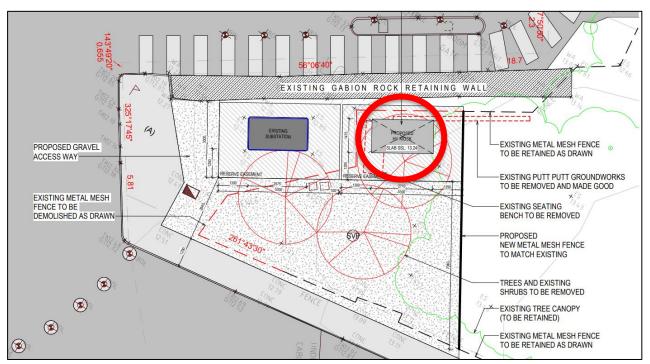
Proposed kiosk substation drawing, with proposed kiosk shown in red (*Source: Proposed HV Kiosk Plan, prepared by Populous, 15 December 2023*)
